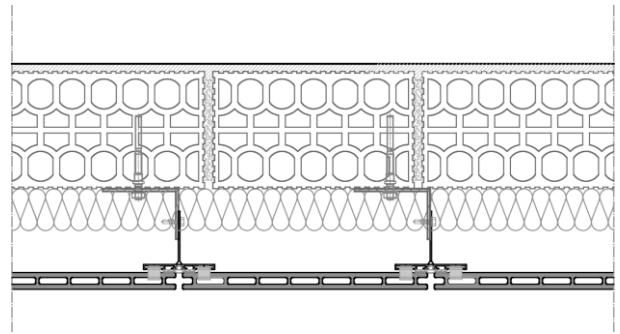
Horizontal section. Faveton® SAH Ceram 20.
